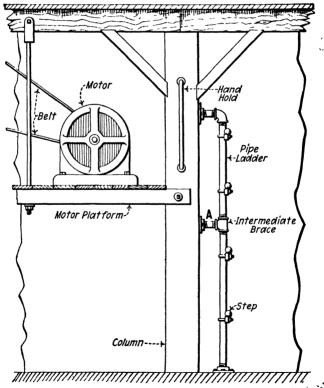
A pipe ladder to a motor platform. Elevation detail shows. Fig. 48.
